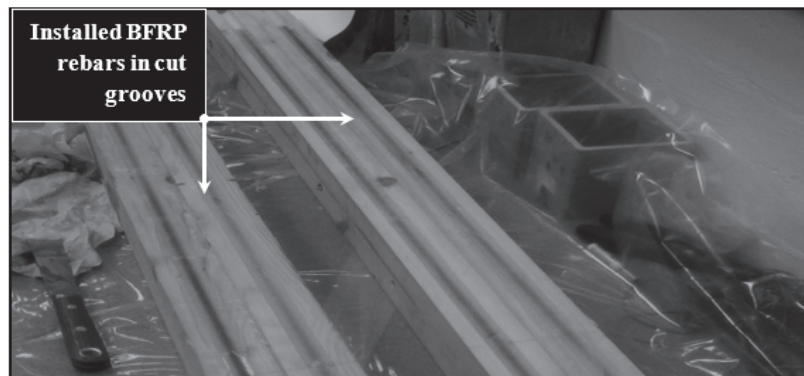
Fabricated near surface mounted and bonded rebars in storage
